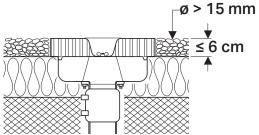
Geberit Pluvia roof outlets 45–100 I with roof gravelling
